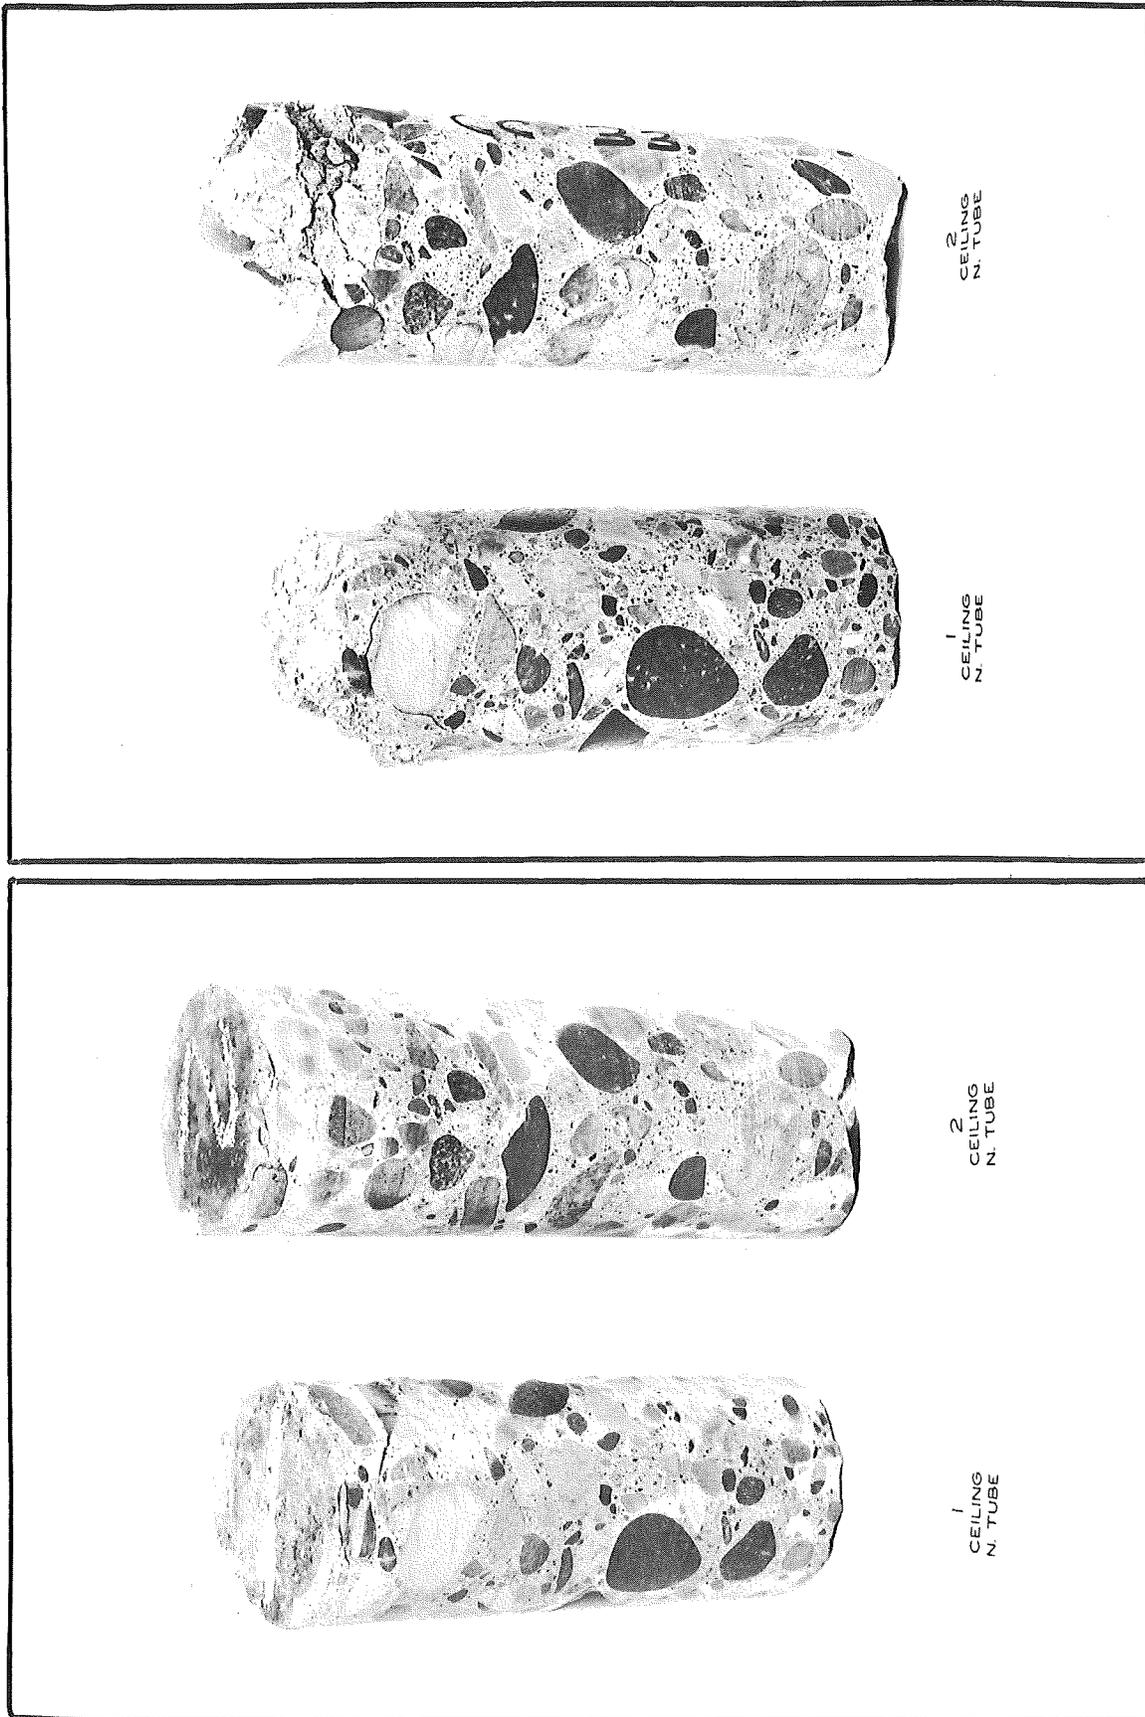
Views of concrete cores taken from the ceiling at the center and west end of the north tube before (left) and after (right) freeze-thaw testing. The right photo clearly shows the vulnerability of severely fire-damaged concrete to freeze-thaw deterioration. (Cores shown inverted).
